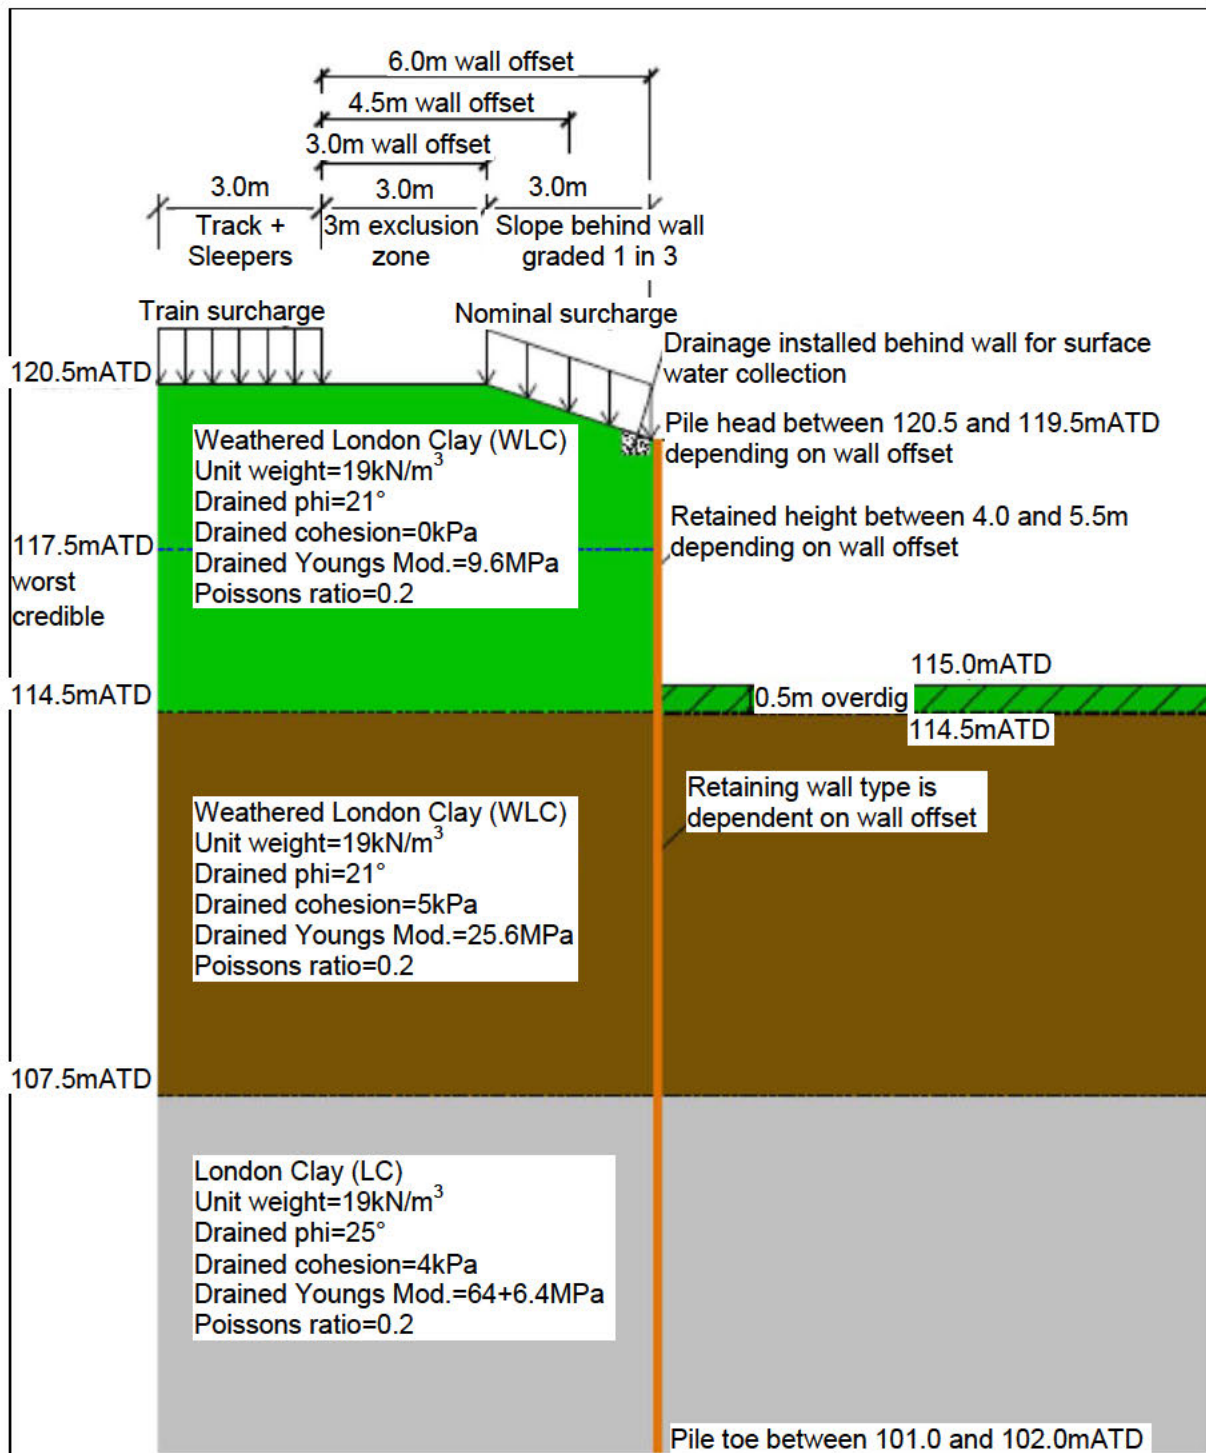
Sketch of general wall section, equivalent to Section B at a 6.0m wall offset.
